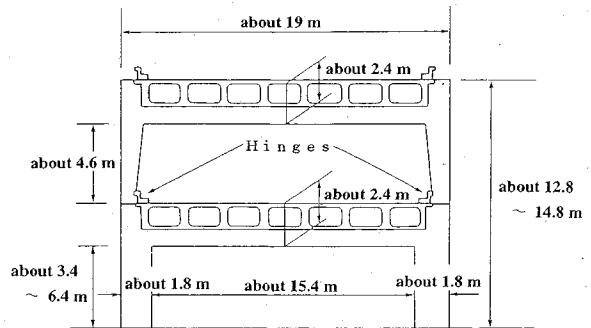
Typical cross section of the Cypress Double-Deck Bridge on Interstate 880-Line¹⁰⁾
